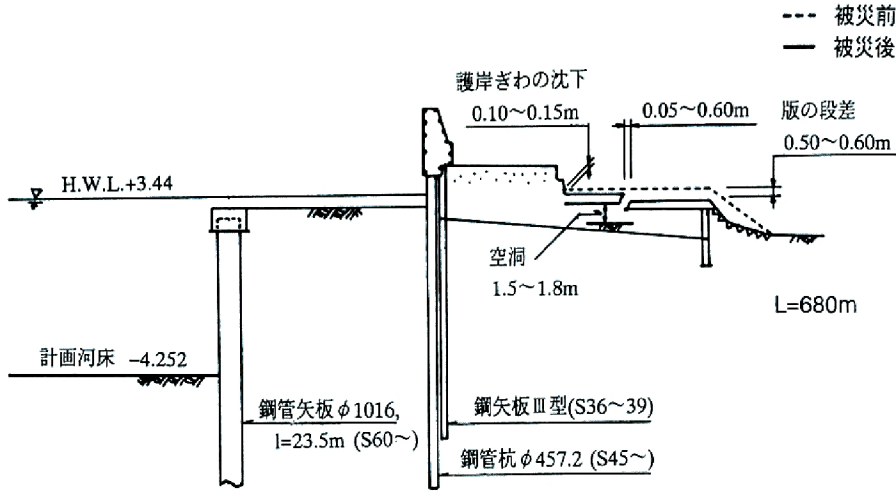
Cross-section of Kanzaki River's embankment reinforced by sheet-piles
